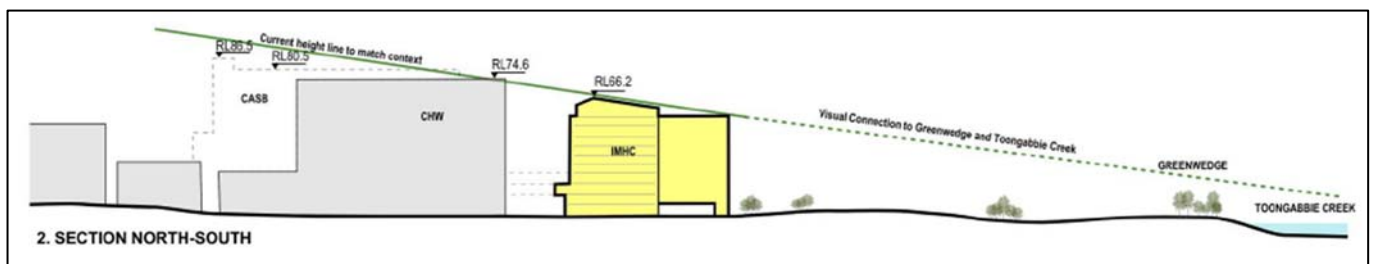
| Height of IMHC building and adjoining context (Source: Design Report)
